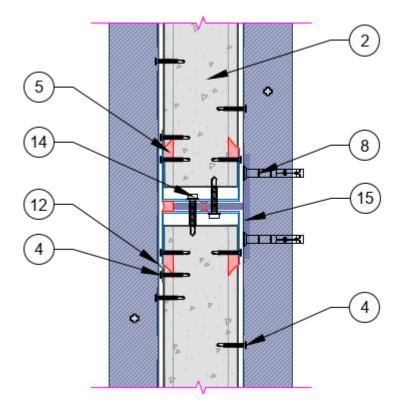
T-bracket connection in dual stack wall at landing/stair stringer
